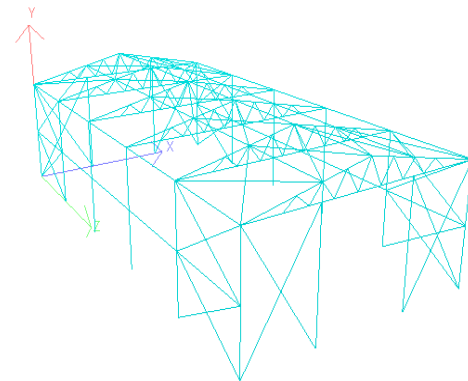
3D Model of Truss Arrangement Configuration(15x30m)
